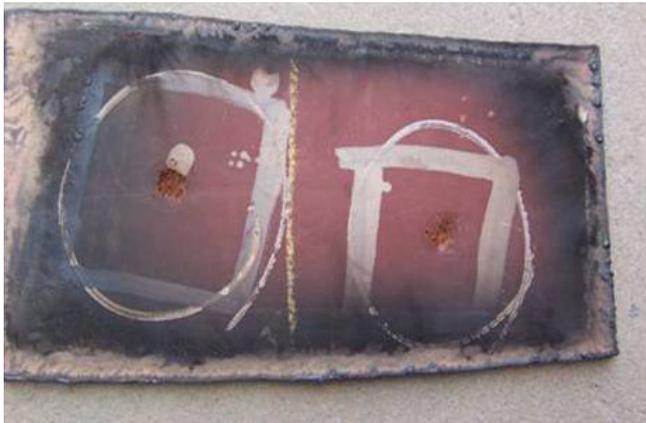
Inner surface of the bottom plate cut from a location away from annular plate showing only pits
